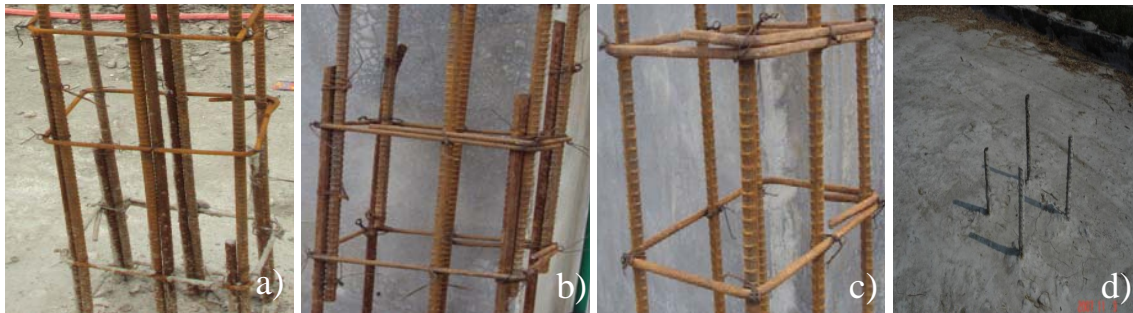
a) Defective stirrups due to 90° bends joint b) Inadequate lap length c) Large spacing of lateral ties in column with 90° bend d) Column reinforcement is too short for the continuity of the column
